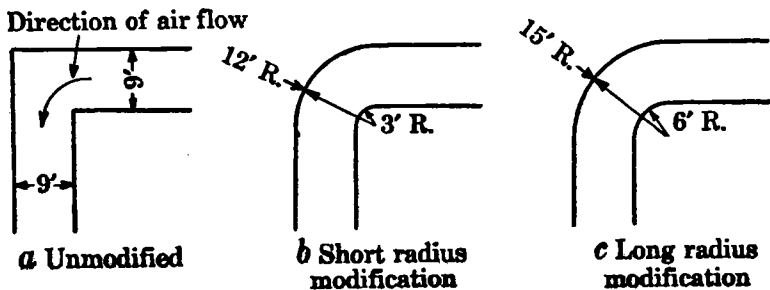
Modifications of both inner and outer corners of right-angle bend
